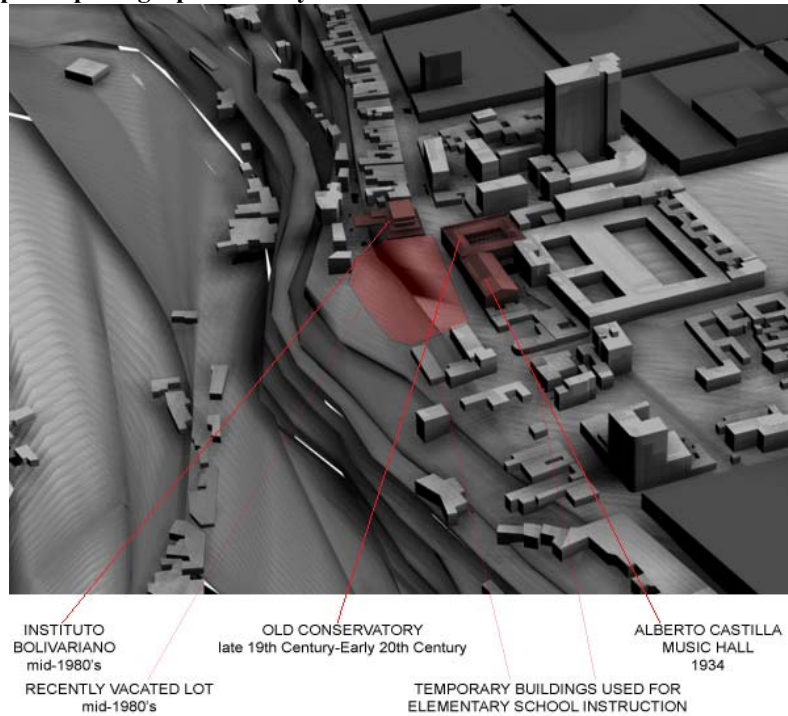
Digital Model Showing Existing Conservatory Buildings and context
